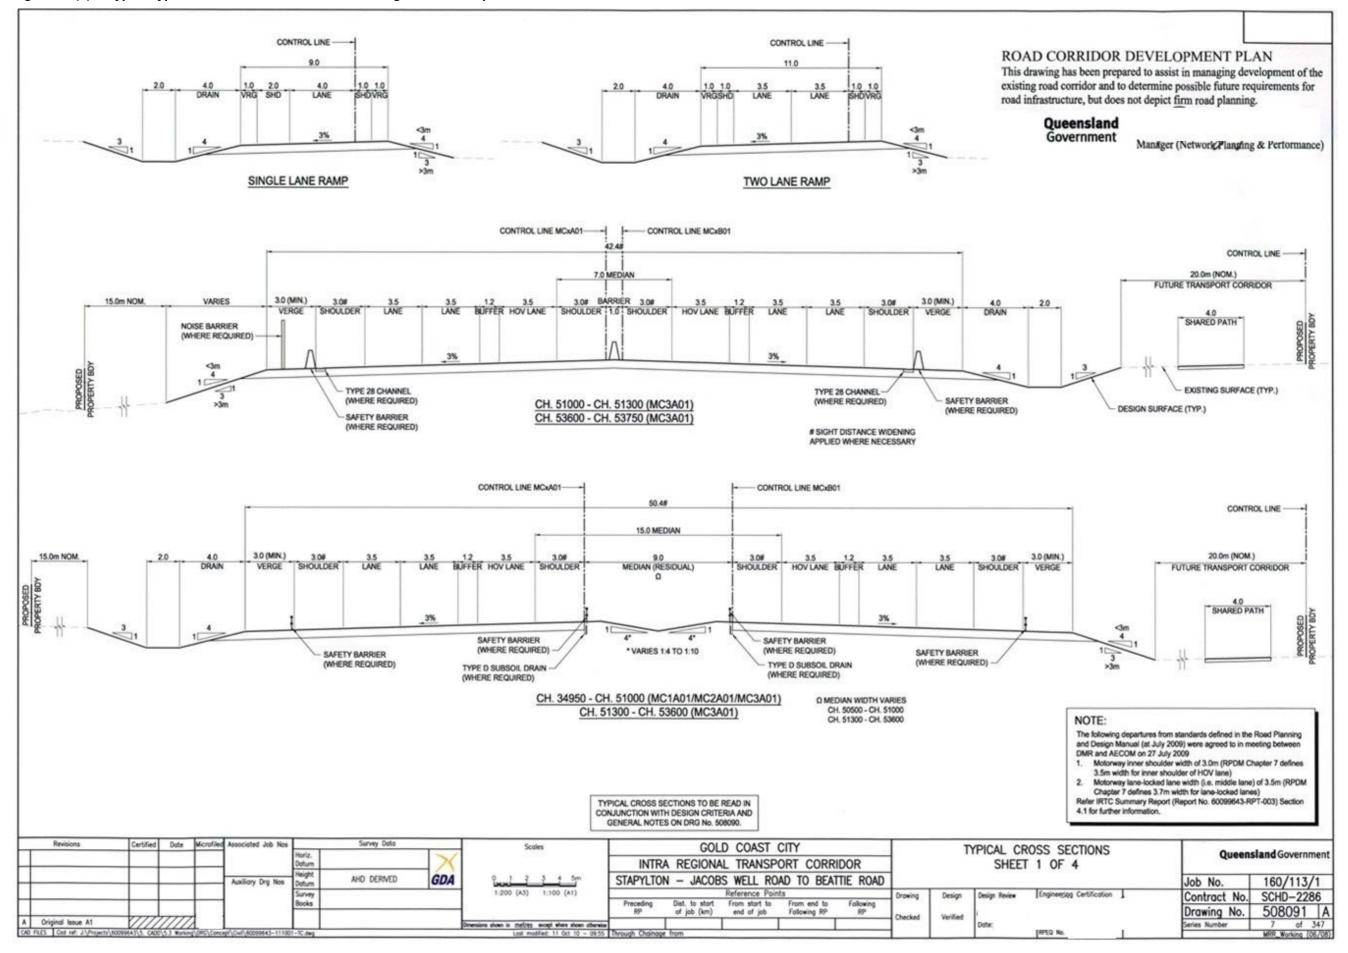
(b) – Type / Typical cross sections and details – registered example
